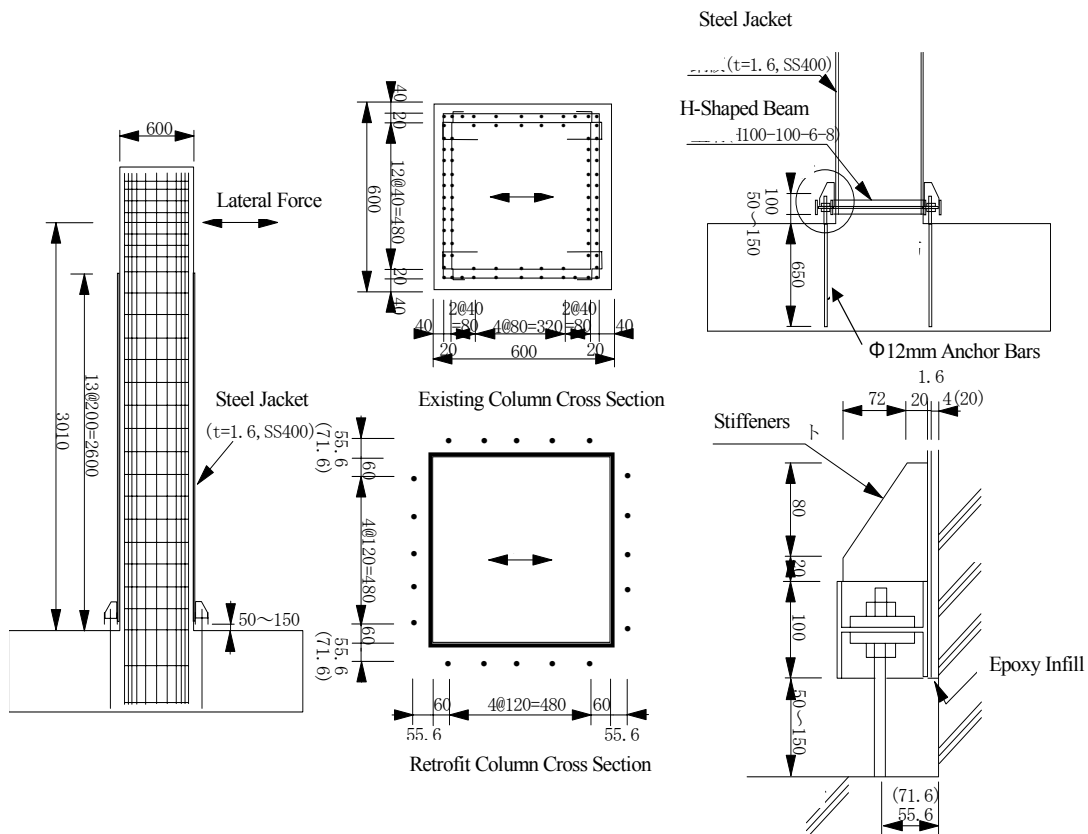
Details of the cyclic loading test specimens for as-built and retrofit reinforced concrete piers
